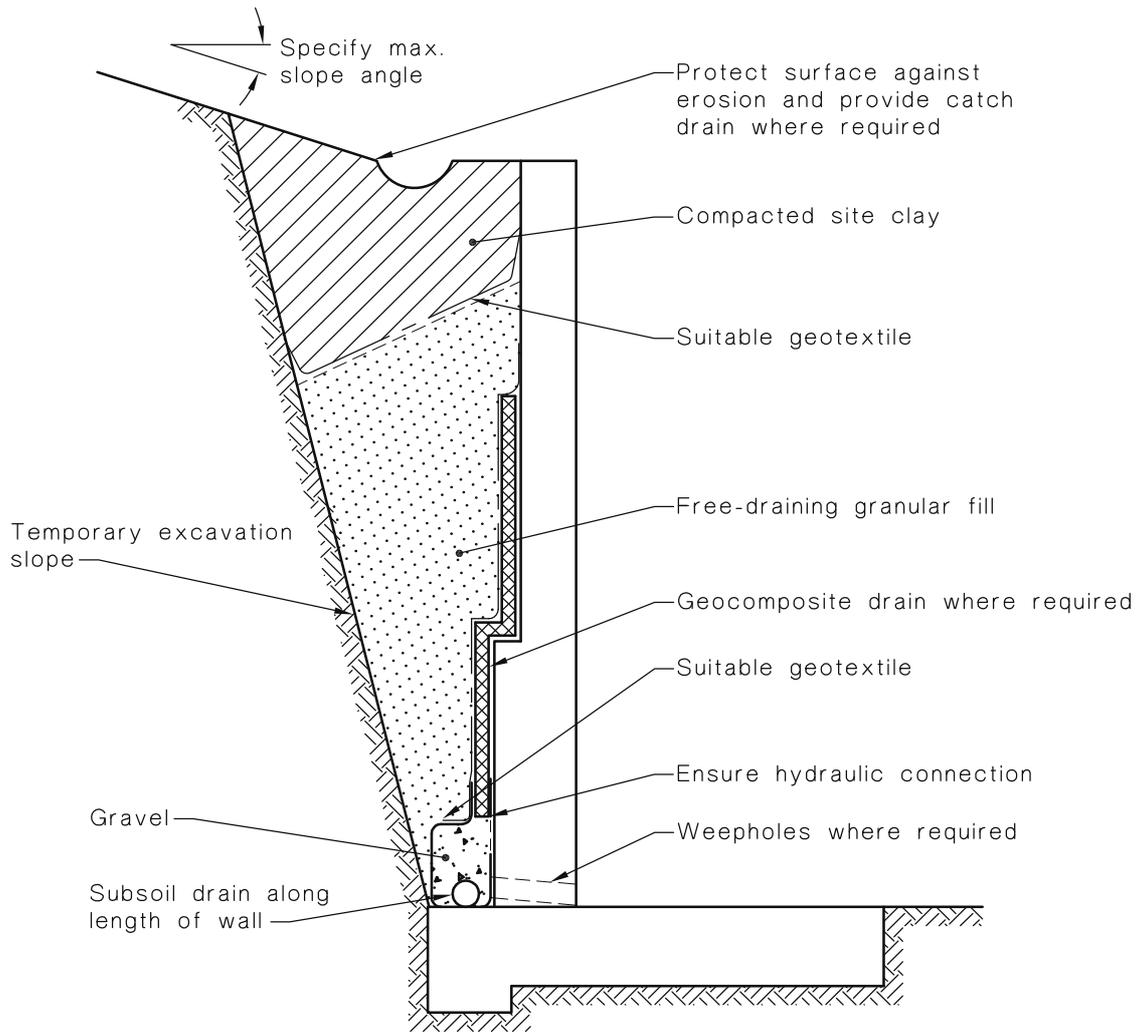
TYPICAL SECTION—CANTILEVERED WALL DRAINAGE, TYPE 1
